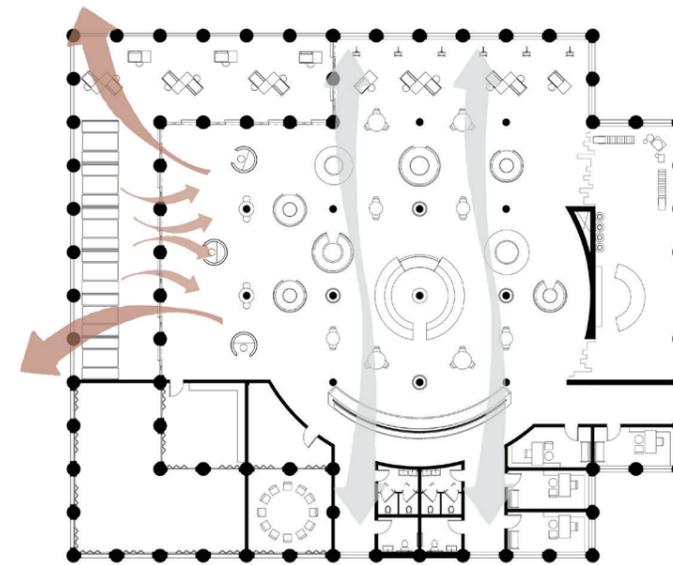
Malath Floor Plan Showcasing the Cross-Ventelation System
